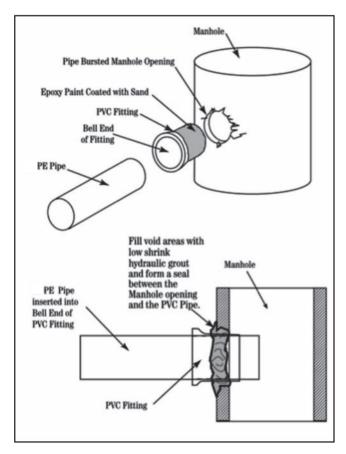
Connecting PE Pipe to Old Manhole with Damaged Inlets/Outlet
